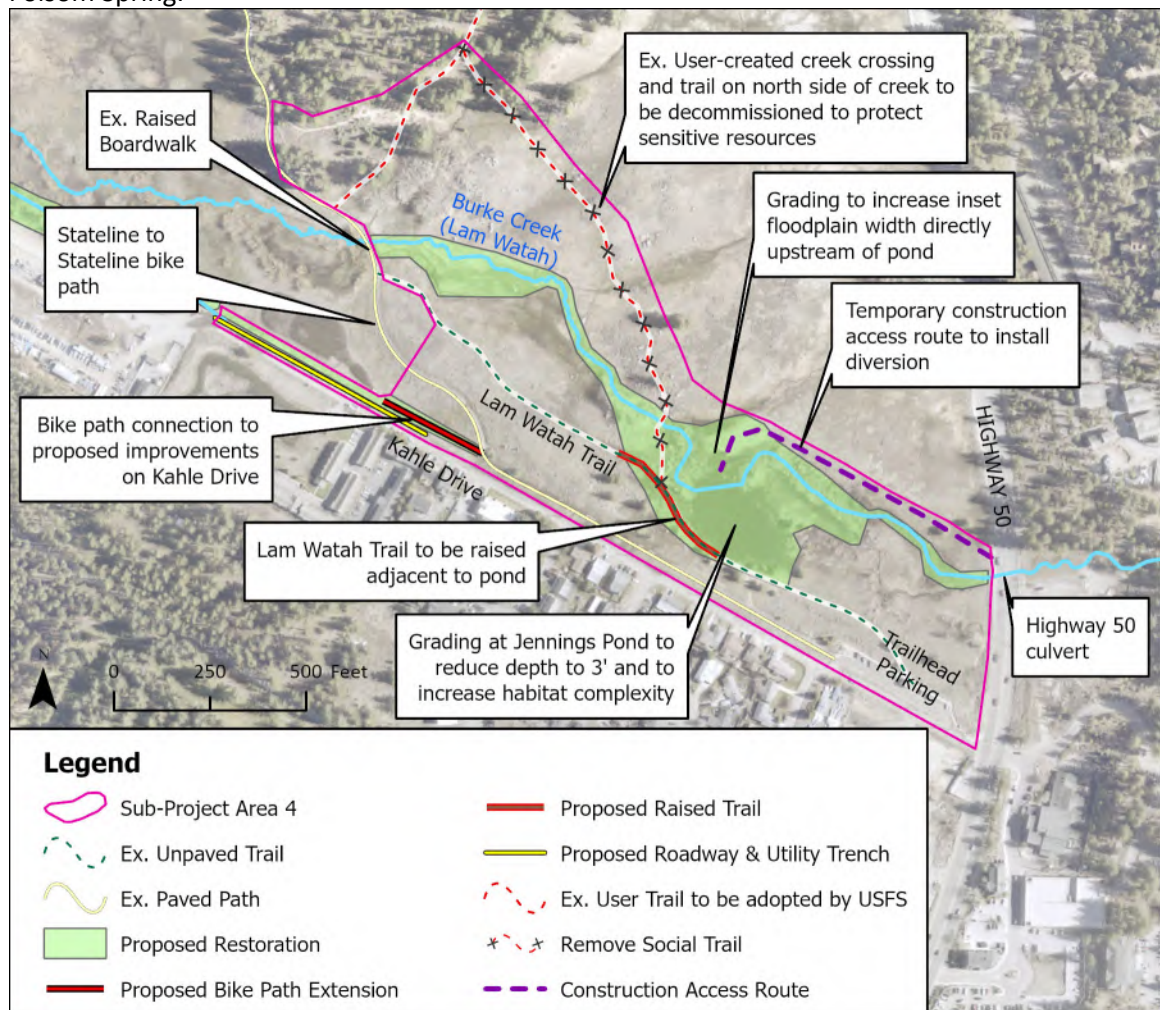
Sub-Project Area 4: Jennings Pond restoration and recreation improvements
